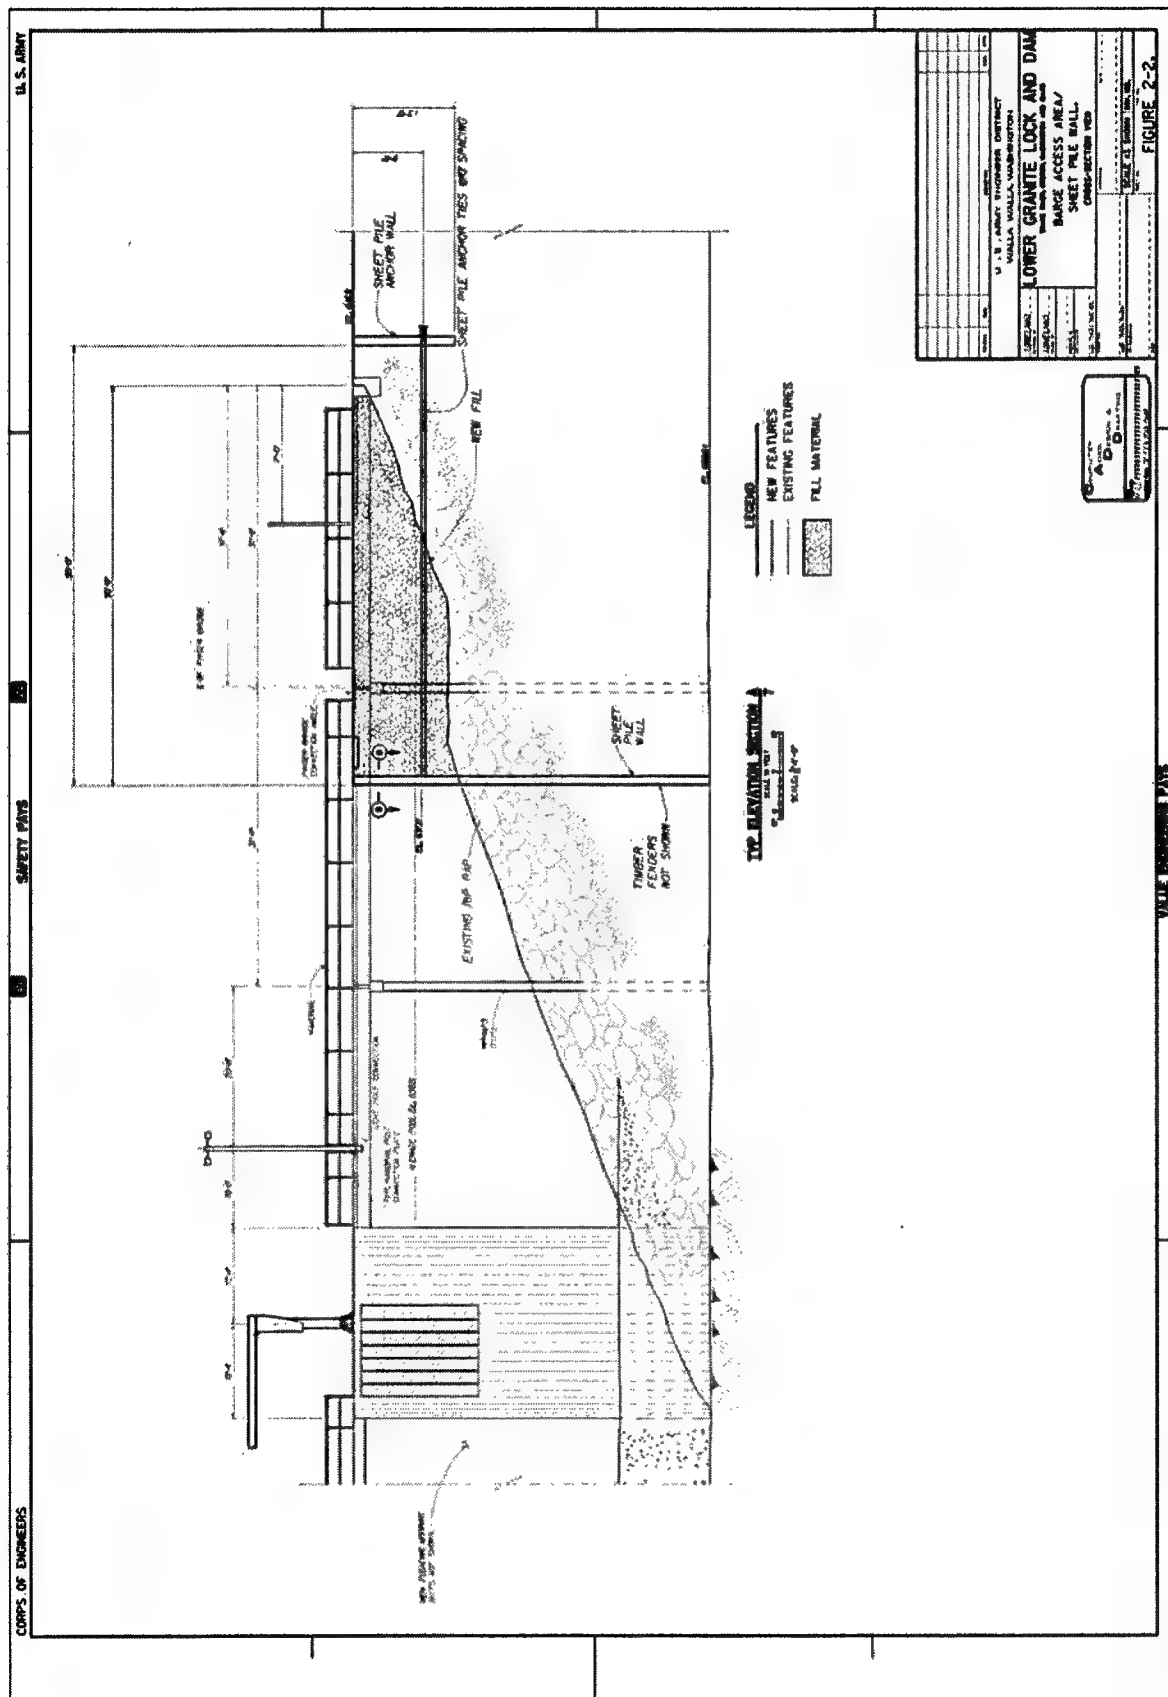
Lower Granite Dam Barge Access Area/Sheet Pile Wall
